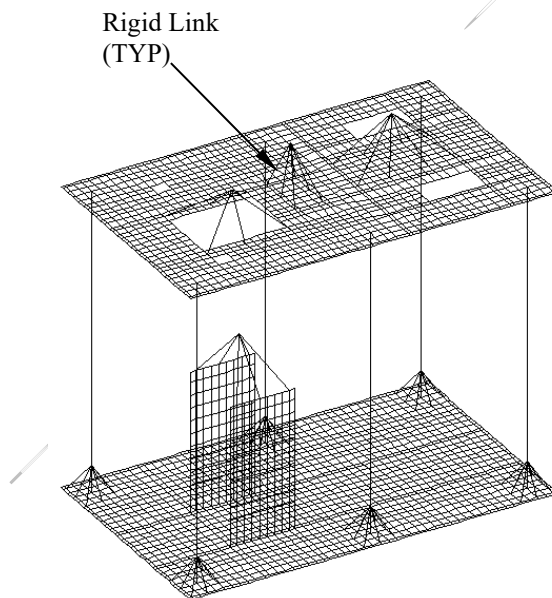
BEAM- PLATE ELEMENT MODEL OF FRAME FOUNDATION WITH BASE RAFT
